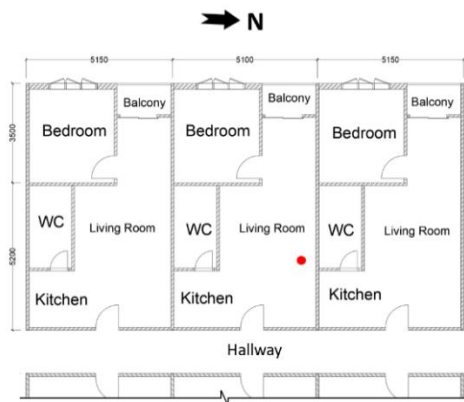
Floor plan and surroundings of building A2, the case study unit located on the 10th floor of the building facing west (the red dot is where the sensor was installed).
